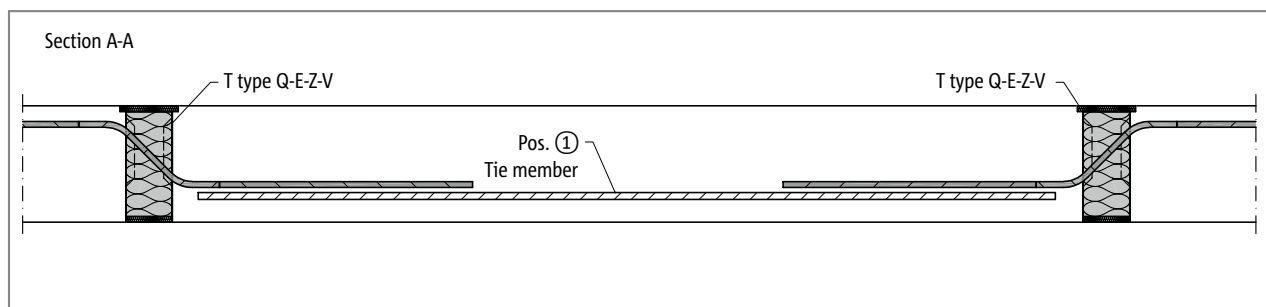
Schöck Isokorb® T type Q-E-Z-V: Tie member connection
